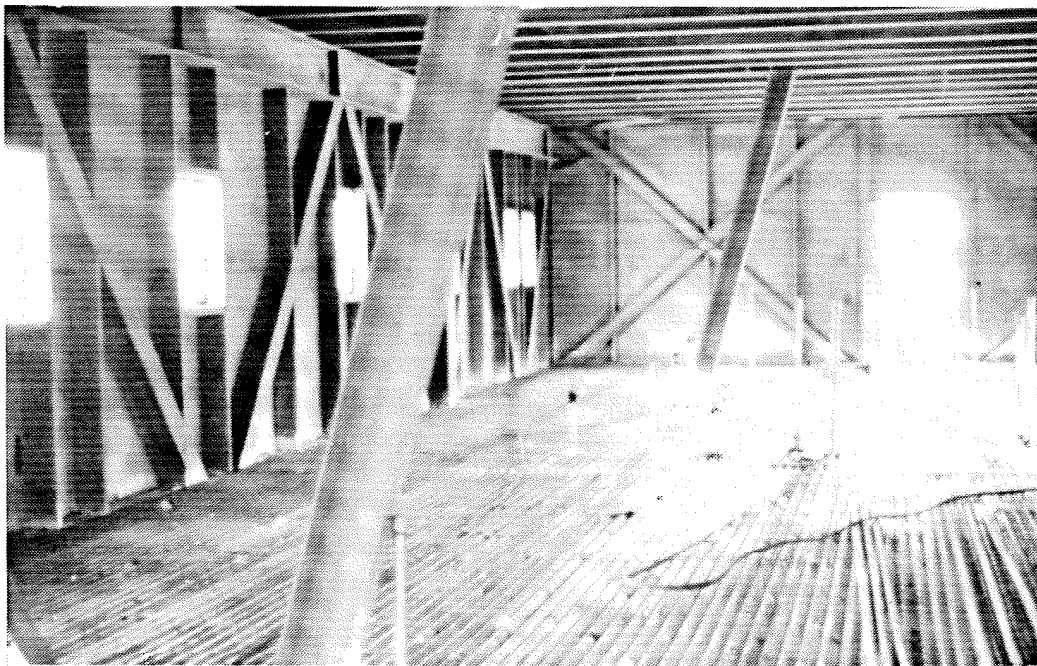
Interior structural framing of a quarters building designed for earthquake loading.
